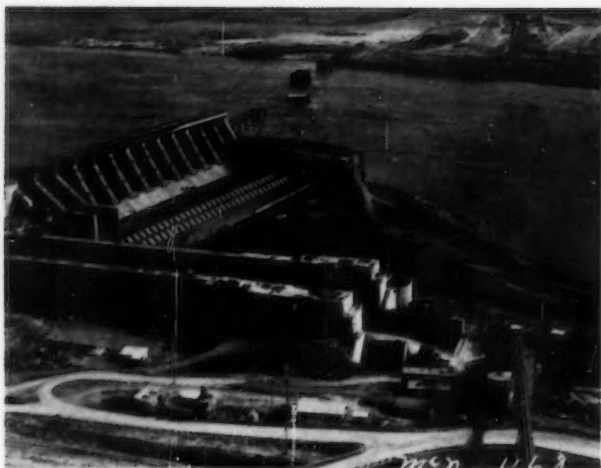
First stage construction, Washington shore navigation lock and 13-1/2 spillway bays in foreground. 6 March 1950
